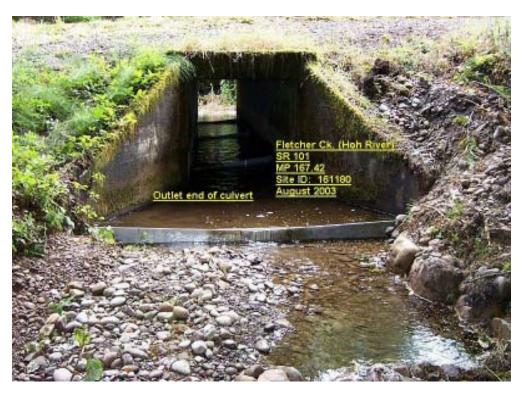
In 2003, WDFW retrofitted this concrete culvert by installing five steel baffles inside the culvert, reducing velocity and increasing depth.
